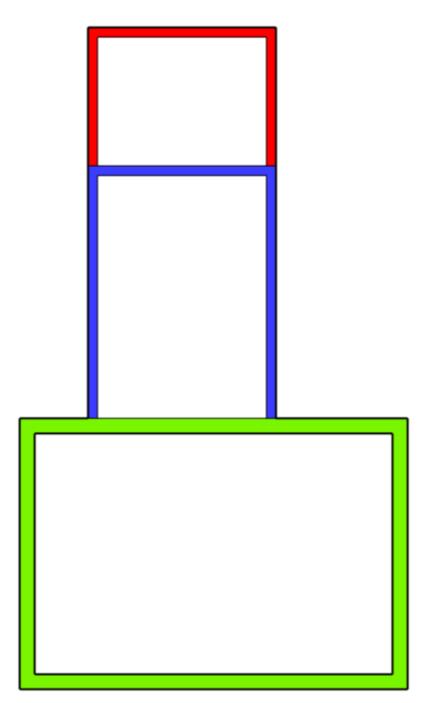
INFERRED DEVELOPMENT SEQUENCE OF 311846 HIGHWAY 6, GREEN IS ORIGINAL LATE 19TH CENTURY VERNACULAR GOTHIC REVIVAL BRICK STRUCTURE, BLUE IS LATER FRAME ADDITION (DATE UNKNOWN), RED IS SECOND FRAME ADDITION (DATE UNKNOWN).
